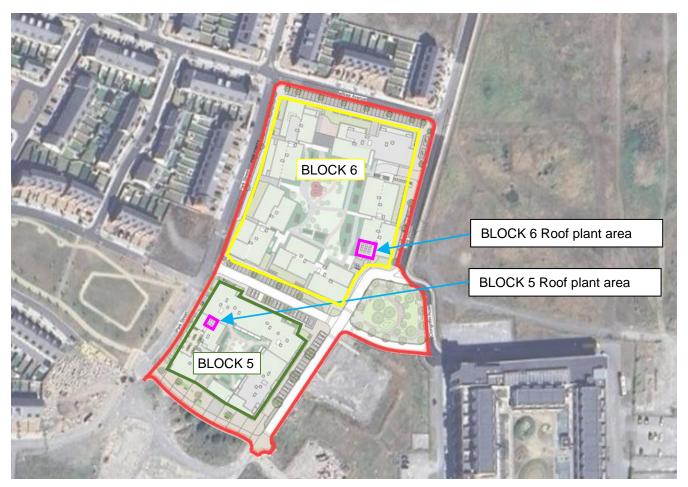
Block 5 and 6 location and roof mounted equipment area locations.
